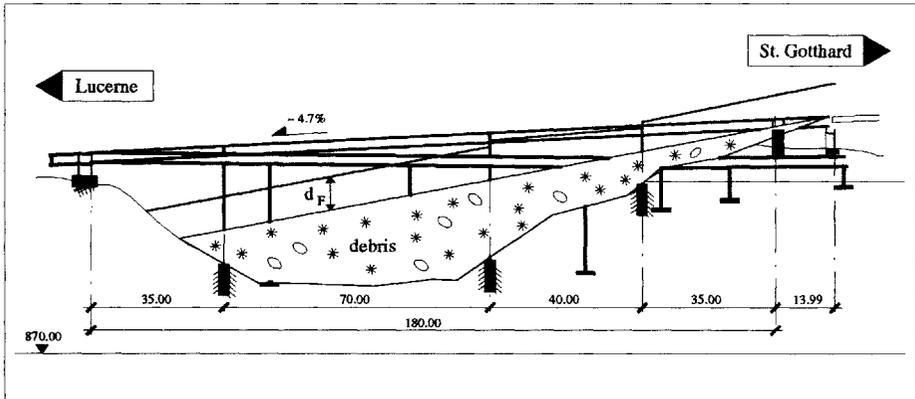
Longitudinal section through the Reuss bridge A2 Wattingen (uphill track ROMEO)
